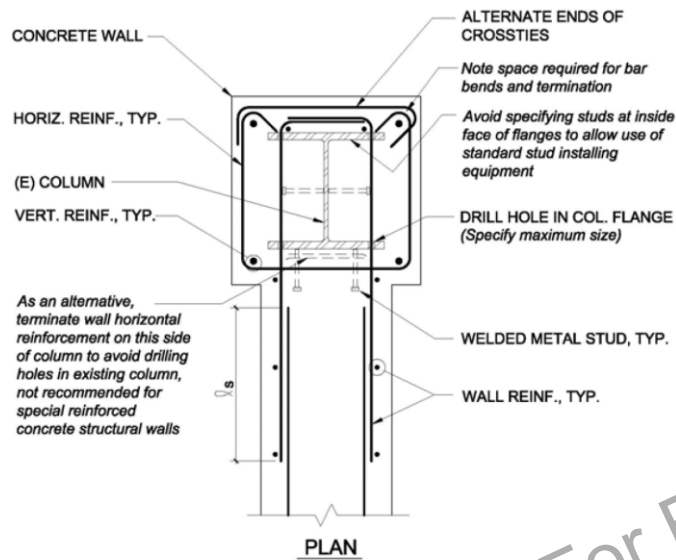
Cast-in-Place Concrete Wall Encasing Existing Column
